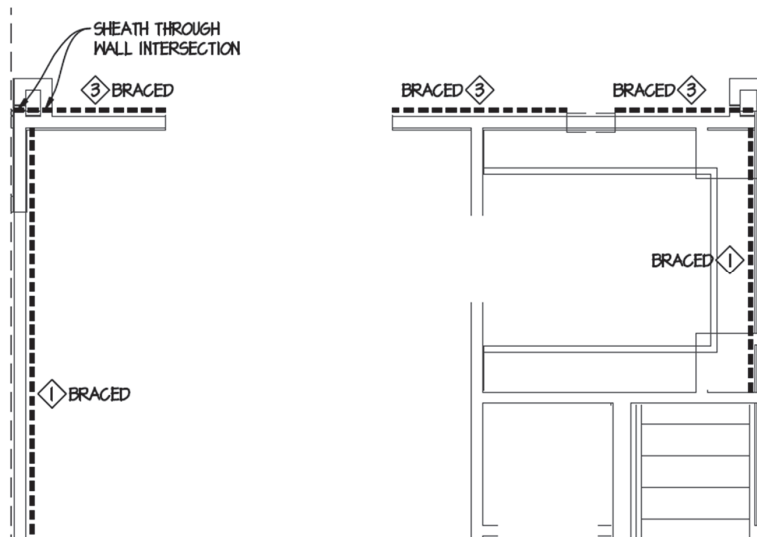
Taken from structural drawings of typical wall sheathing (i.e. shear wall) locations.
